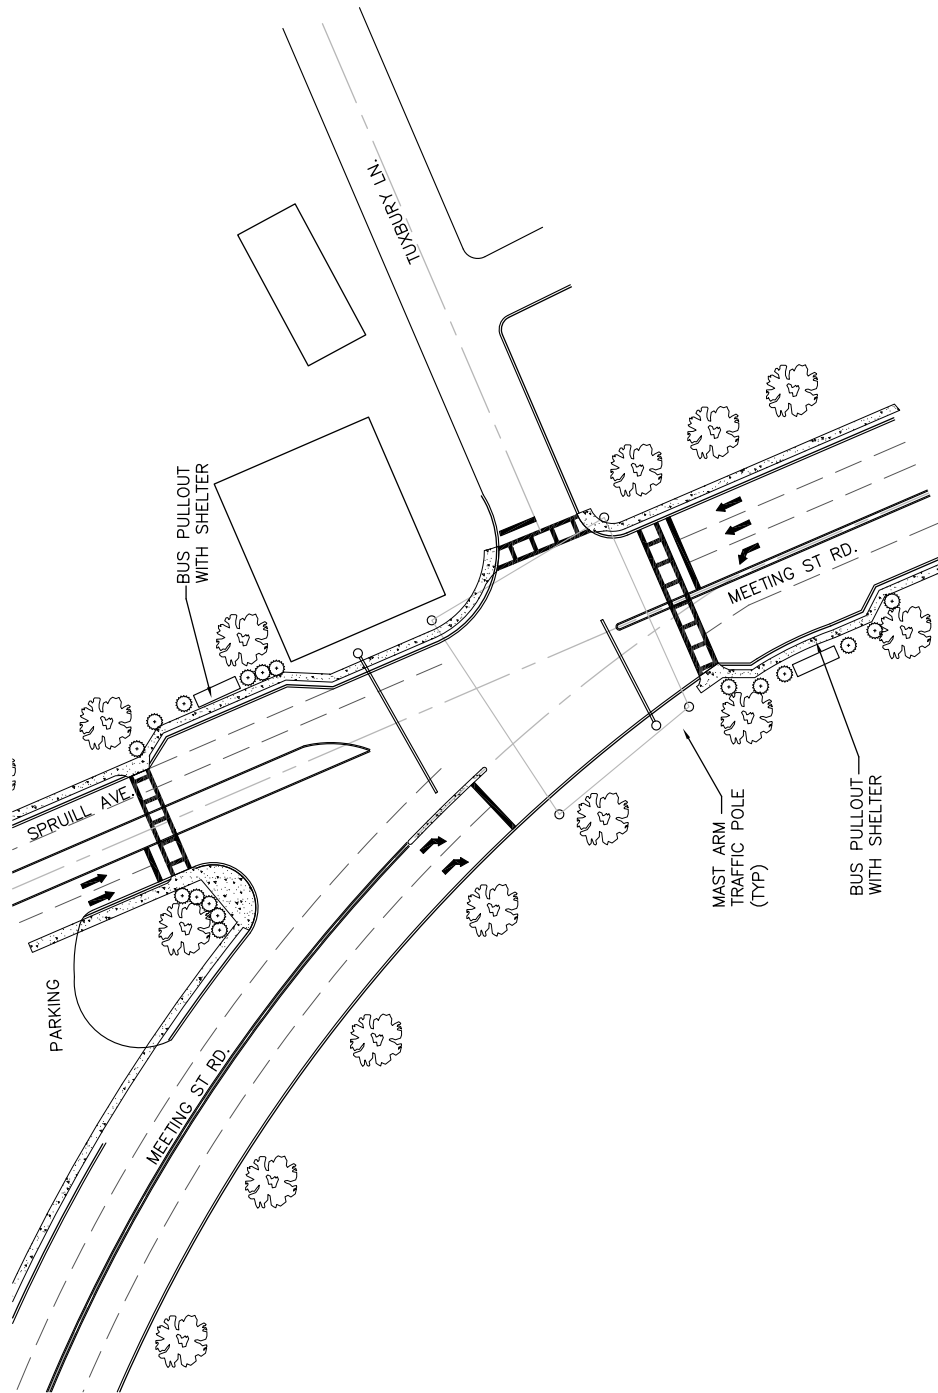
Intersection Improvements: Spruill Avenue & Meeting Street
